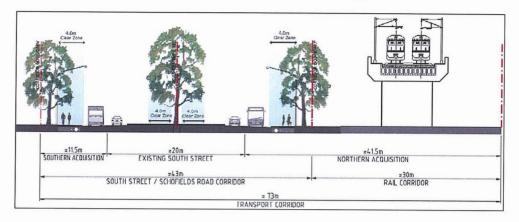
Typical Rail Corridor Cross Section on Viaduct adjacent to proposed South Street/Schofields Road
